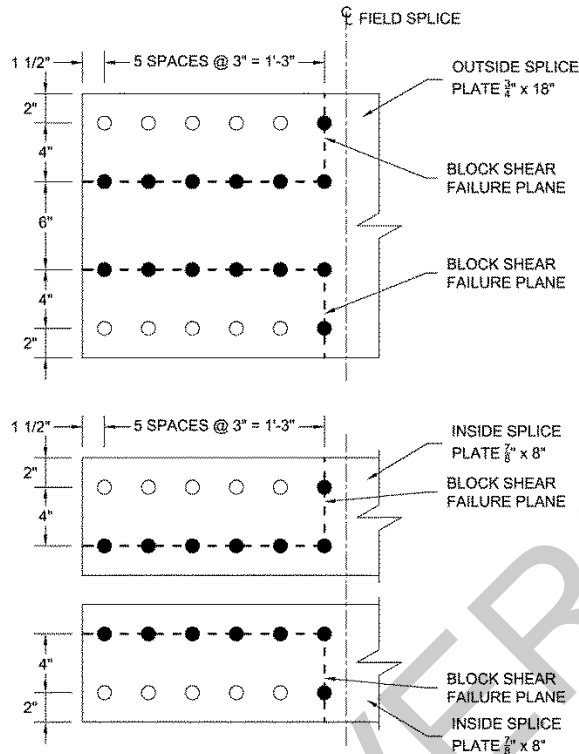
Bottom Flange Splice – Assumed Block Shear Failure Planes in the Splice Plates
